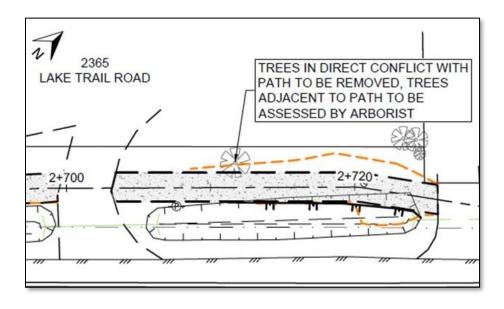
Tree removal on the north side of the driveway at 2365 Lake Trail Road
